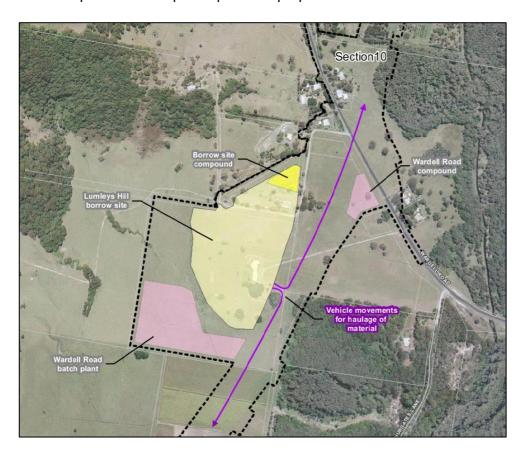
The proposed site at Lumleys Hill for the site compound, batch plant and borrow site.
